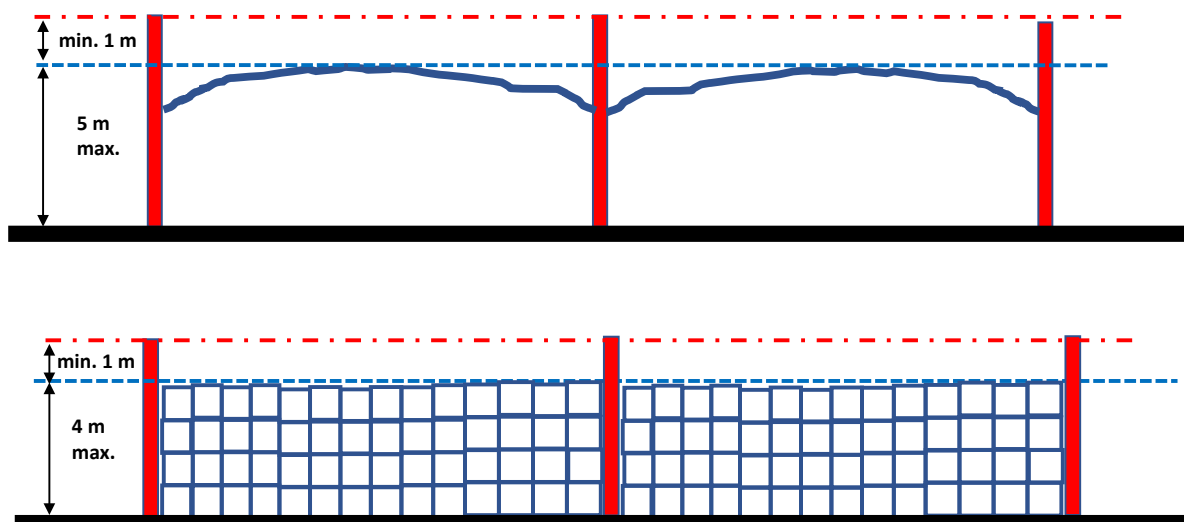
Requirements for bulk storage (above) and free-standing storage (below): maximum permissible storage height and partition walls which are higher by at least 1 m; in addition, the stored materials shall be at least 1 m less than the wall depth on the open sides of the warehouse
